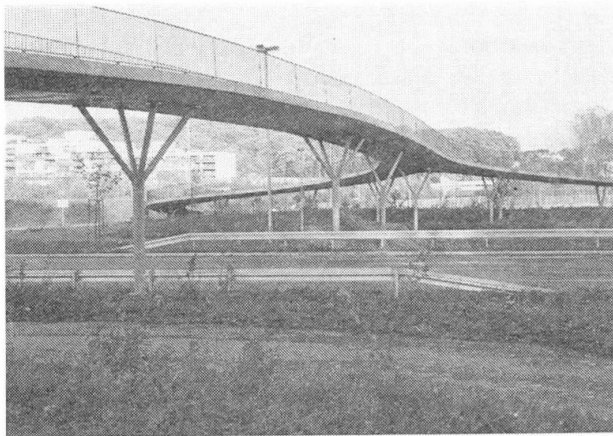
A pedestrian bridge, slender steel tubes supporting a concrete slab
